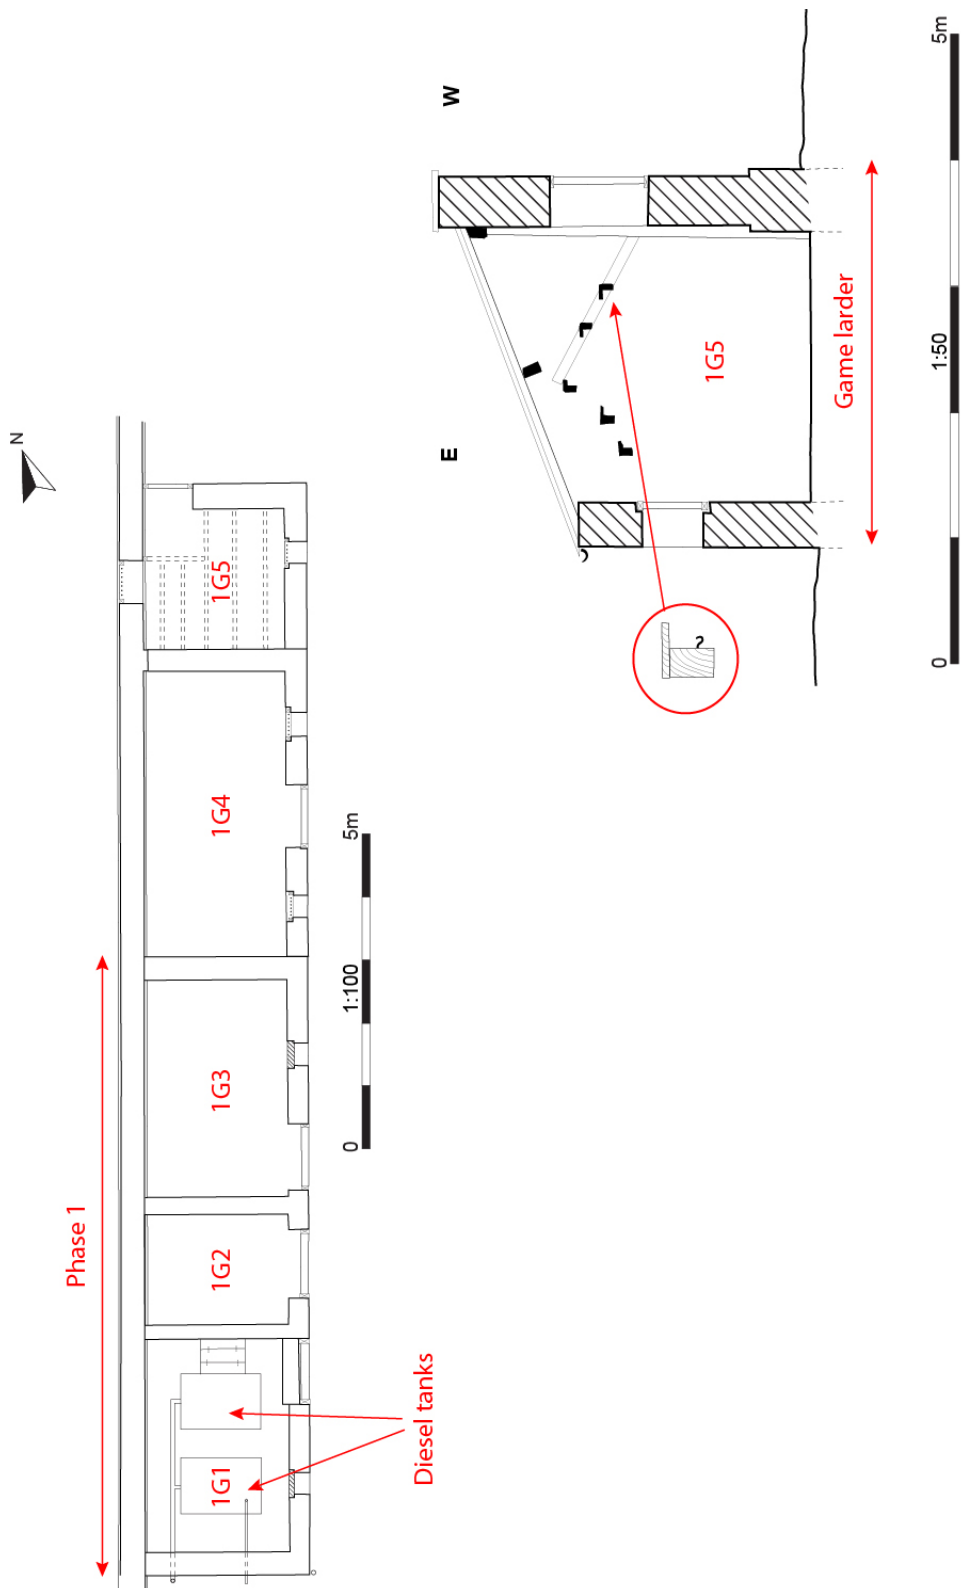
Ground floor plan of the Outbuildings and cross section (west-east) through room 1G5
